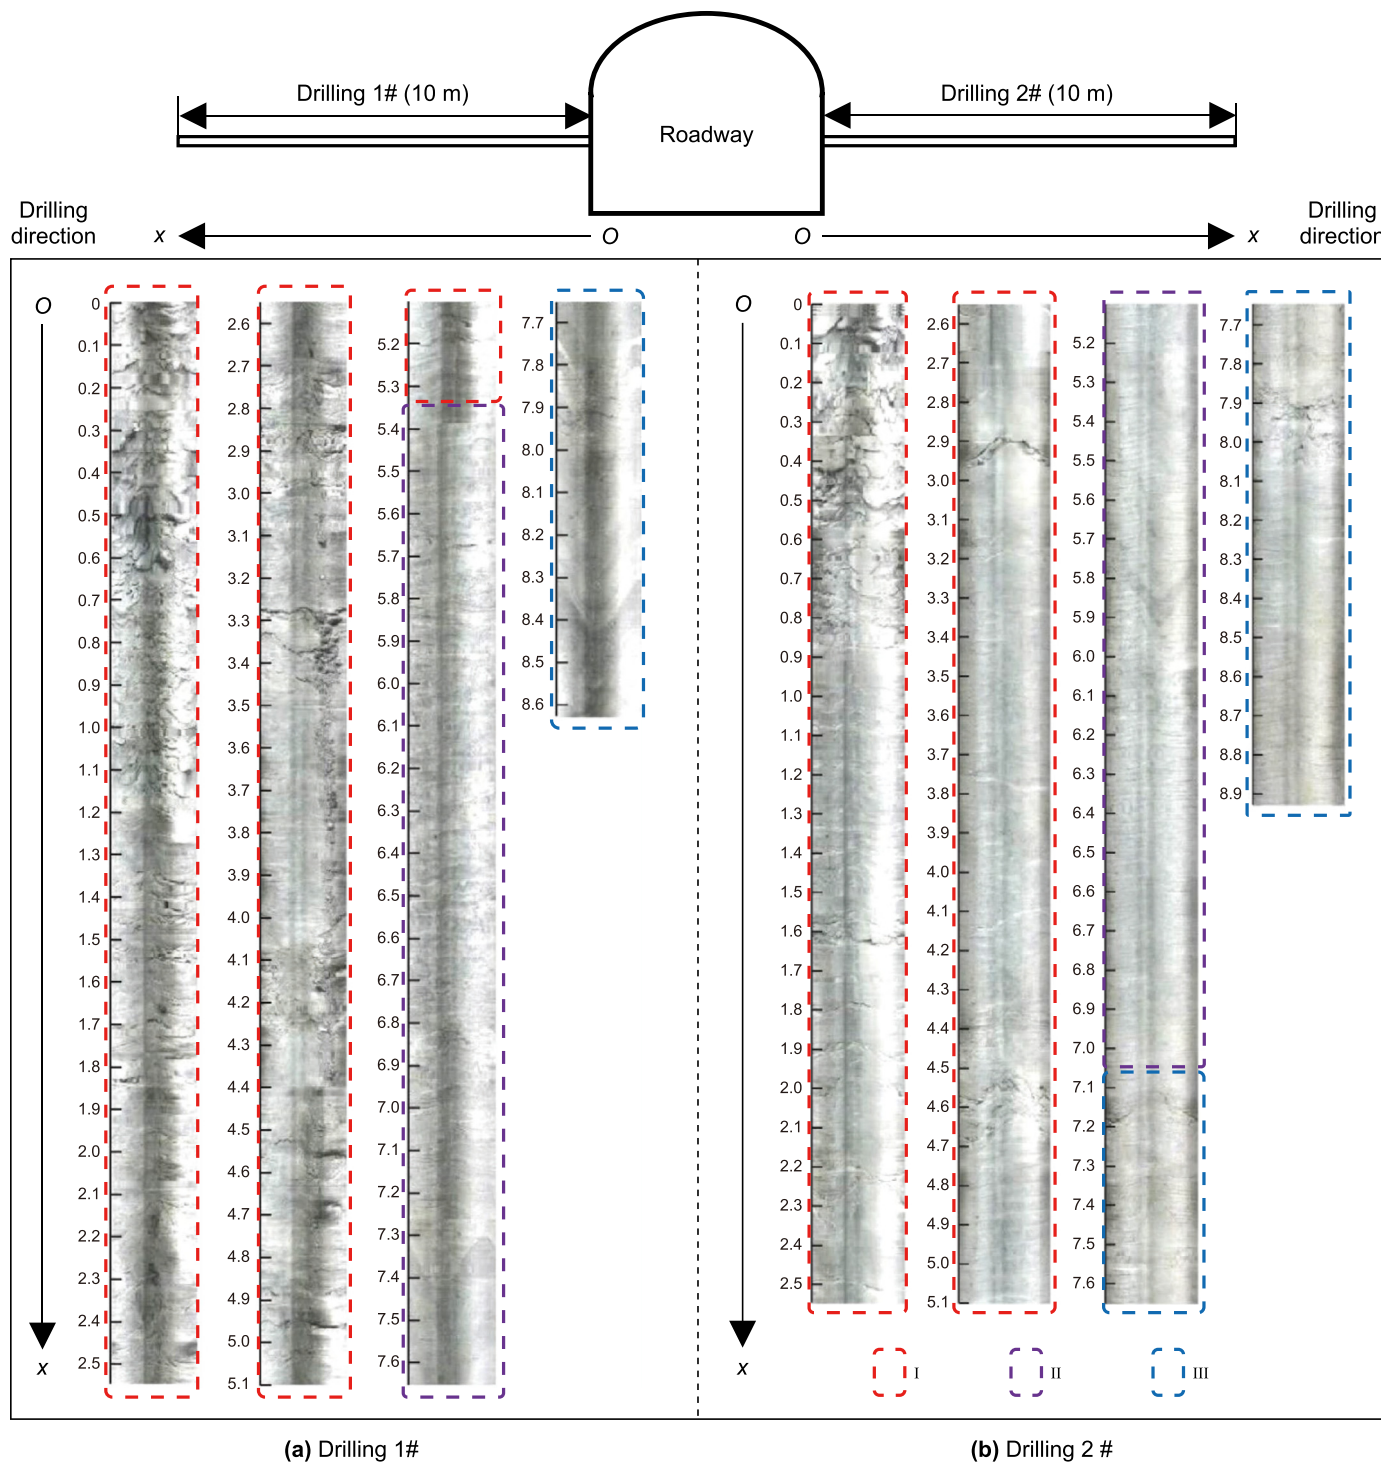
Identification of excavation damage zone based on the drill peep of boreholes in the side wall of roadway.
